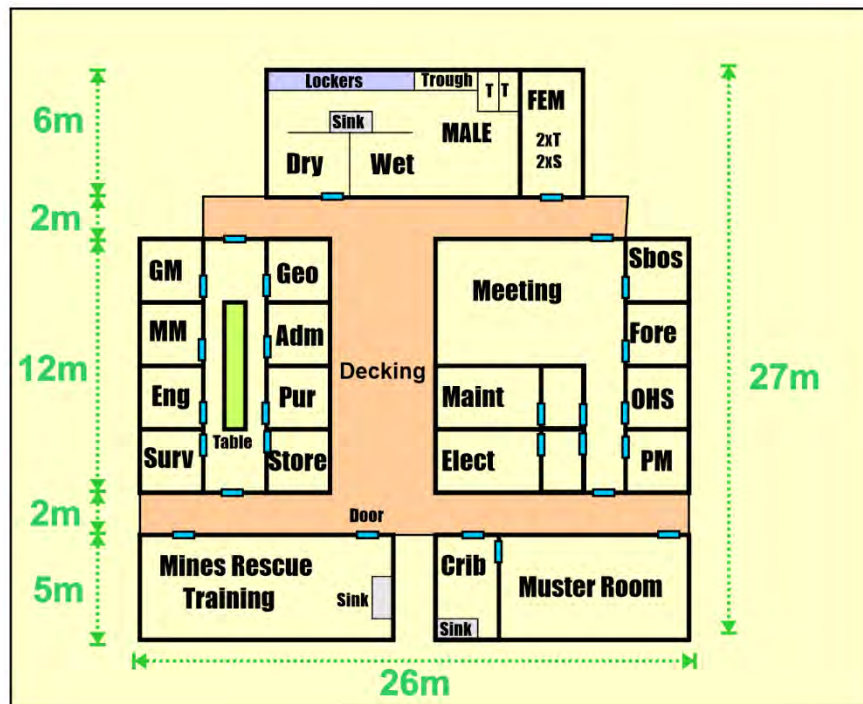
Central Administration Facilities Conceptual Layout.
